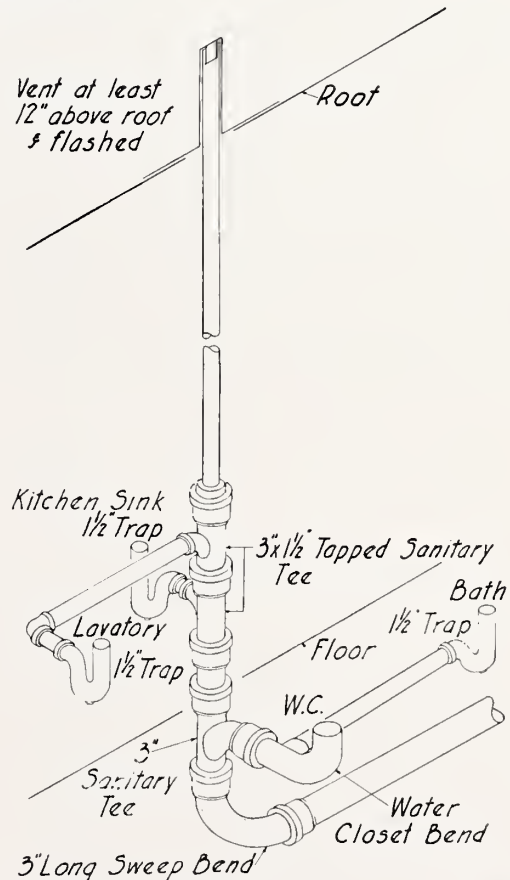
Stack-vented piping lay-out for one-story house.
